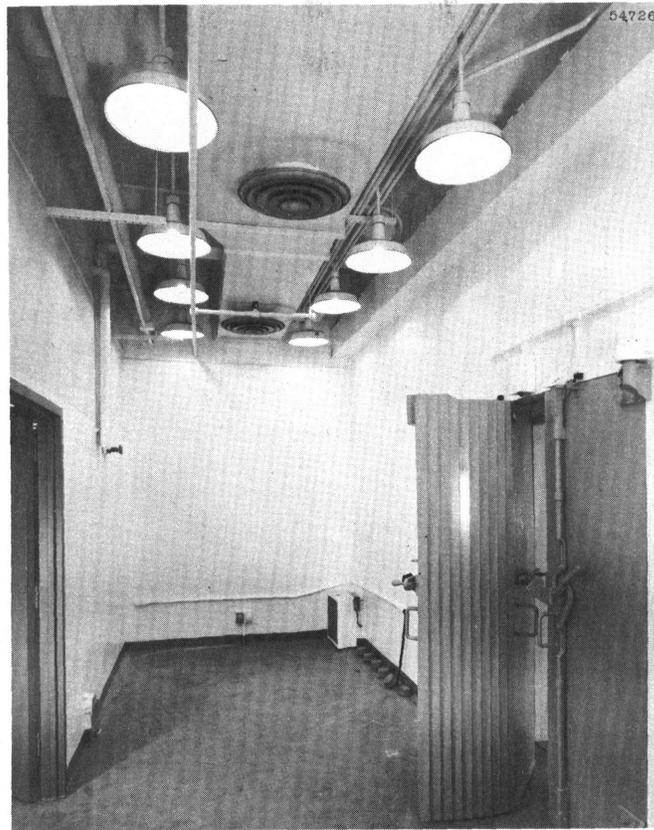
Interior view of isolation cubicles showing lighting arrangement and air supply
